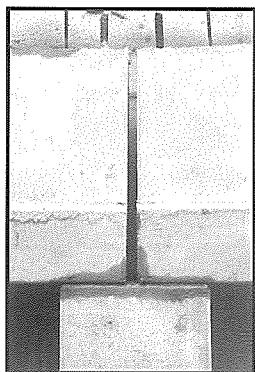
Column/Beam Connection With Vertical Dowel Bars
